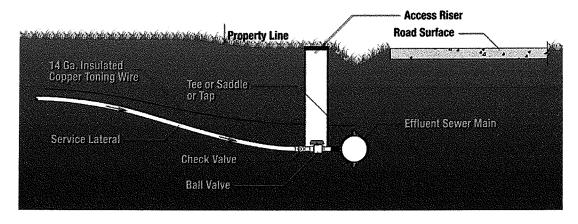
Typical Service Connection to Effluent Sewer Main
